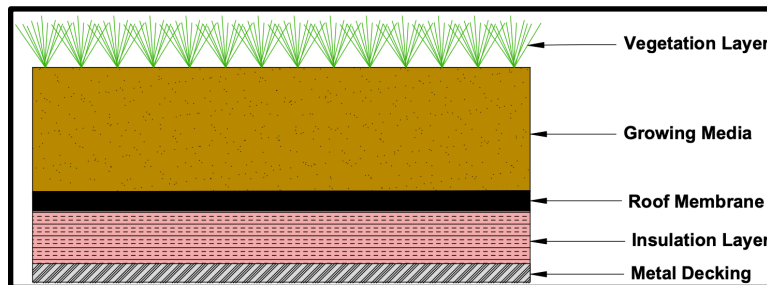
Layout of roof structure and green roof layers implemented in EnergyPlus.
